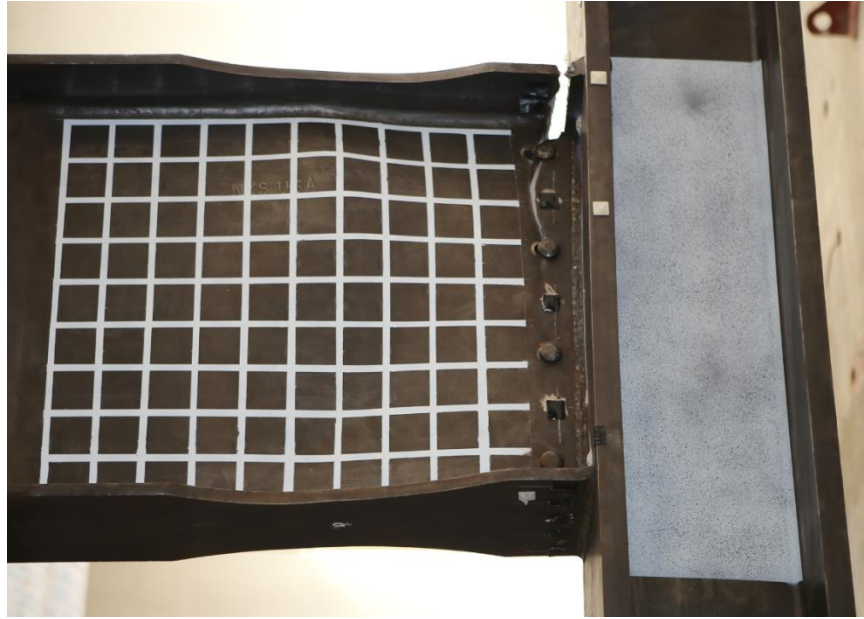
Specimen C3: Beam Top Flange Fracture
